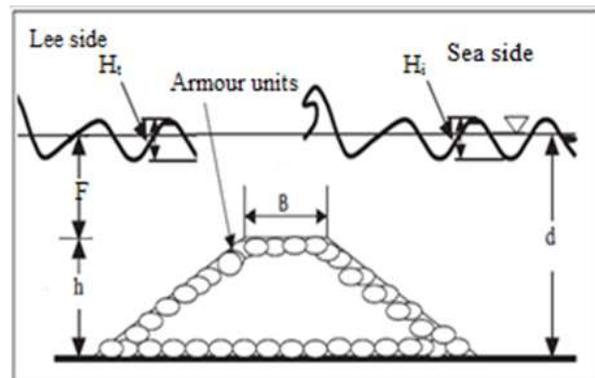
Typical cross section of Submerged Reef Breakwater
